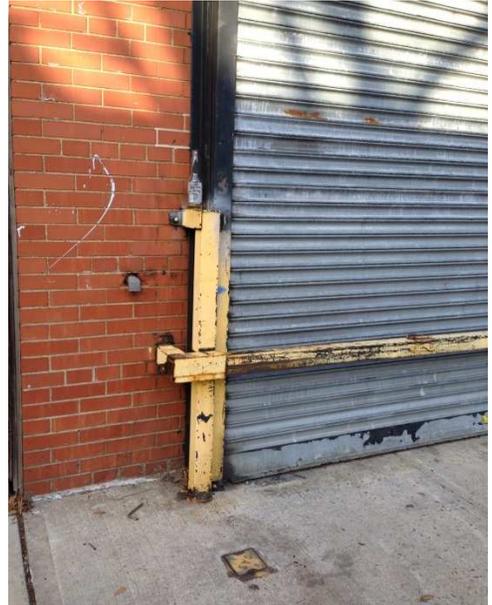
View of old fill port and historic AST vent pipe beside north garage bay door
